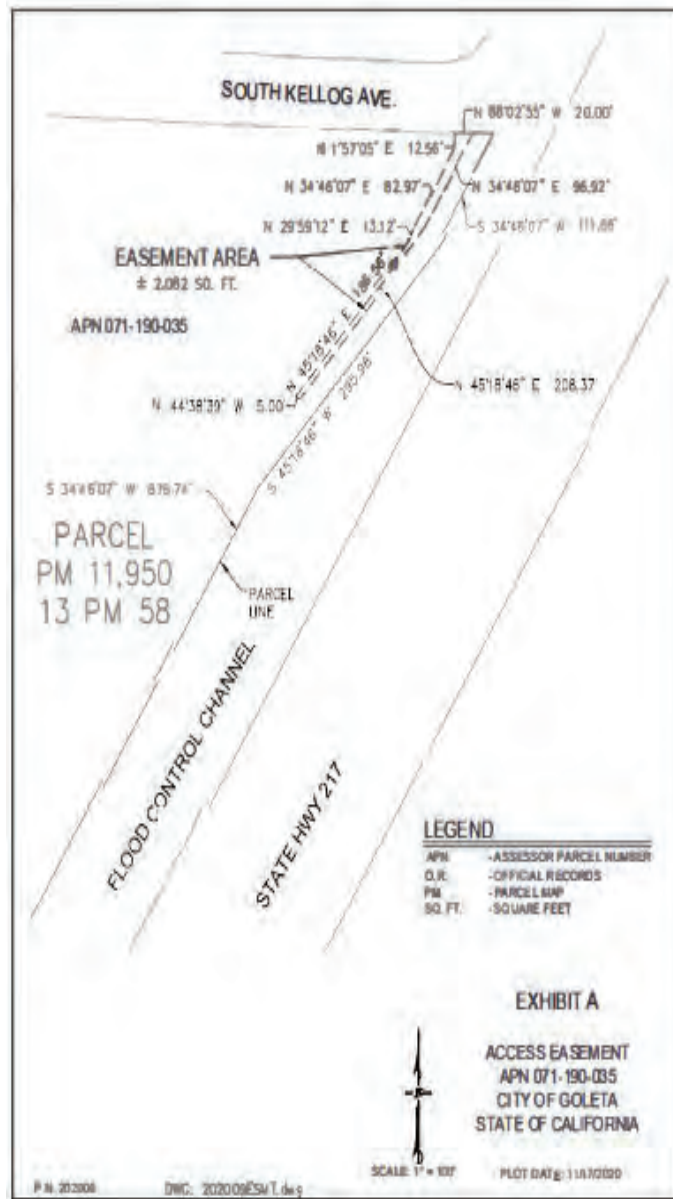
EXHIBIT A - SITE PLAN SHOWING THE PREMISES
